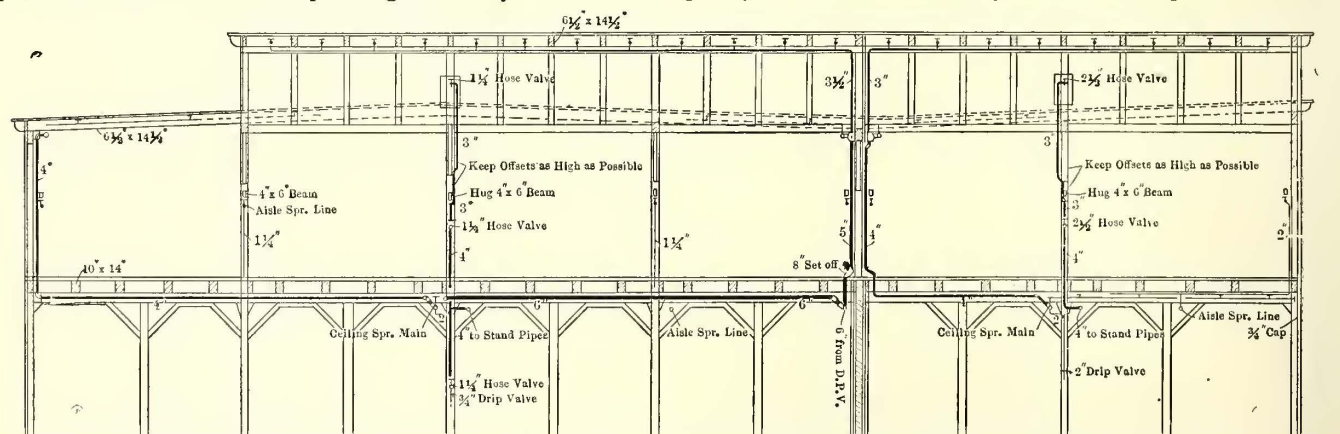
Fire Protection of Milton Car House—Cross-Section, Showing Location of Sprinklers, Valves, Etc.
